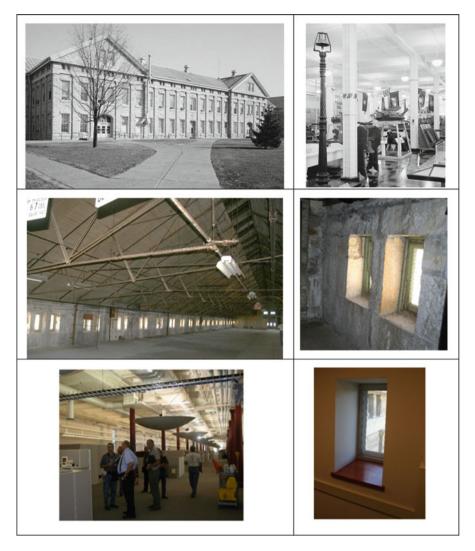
Example of attic renovation of the building at Rock Island Arsenal. Building has been constructed between 1866 and 1872 and used as a combination of administration and technological shop building. The building had uninsulated roof and walls and single pane windows; the attic has not been used. In 2006, the building has been upgraded to become a landscape office space. As part of the renovation, walls have been insulated using blow-in cellulose insulation, windows have been replaced and the gaps between windows and walls sealed, the roof has been insulated using spray foam insulation and a new reflecting ambient lighting system has been installed, new air heating and ventilation systems have been installed to meet IAQ and thermal comfort needs. Source: Library of Congress (top left, top right); Alexander Zhivov (middle-left, middle right, bottom left, bottom right)
